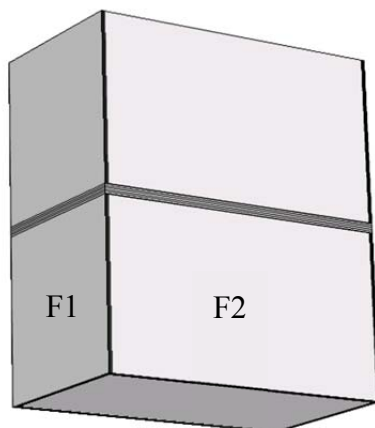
Geometry of the numerical model of two vertical rooms - F1: flanking wall 1; F2: flanking wall 2
